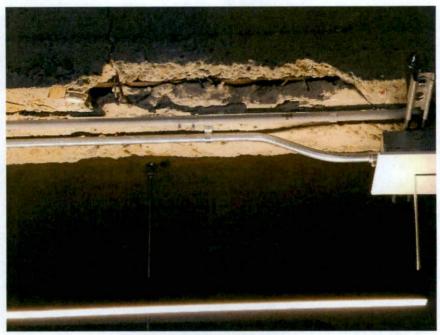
Example of cracked concrete cover over beam and exposed rebar – Eighth Floor.
